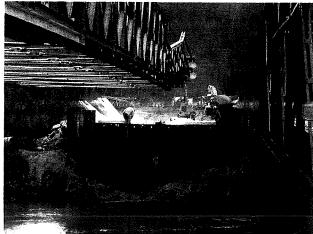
Iliamna River Bridge with Open Cell abutment and Bailey Bridge launch in progress.
